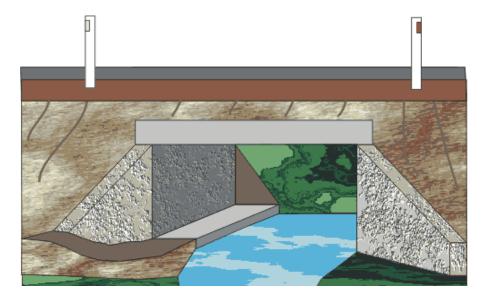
Example Culvert as Underpass (extracted from Rowe, 2010).
